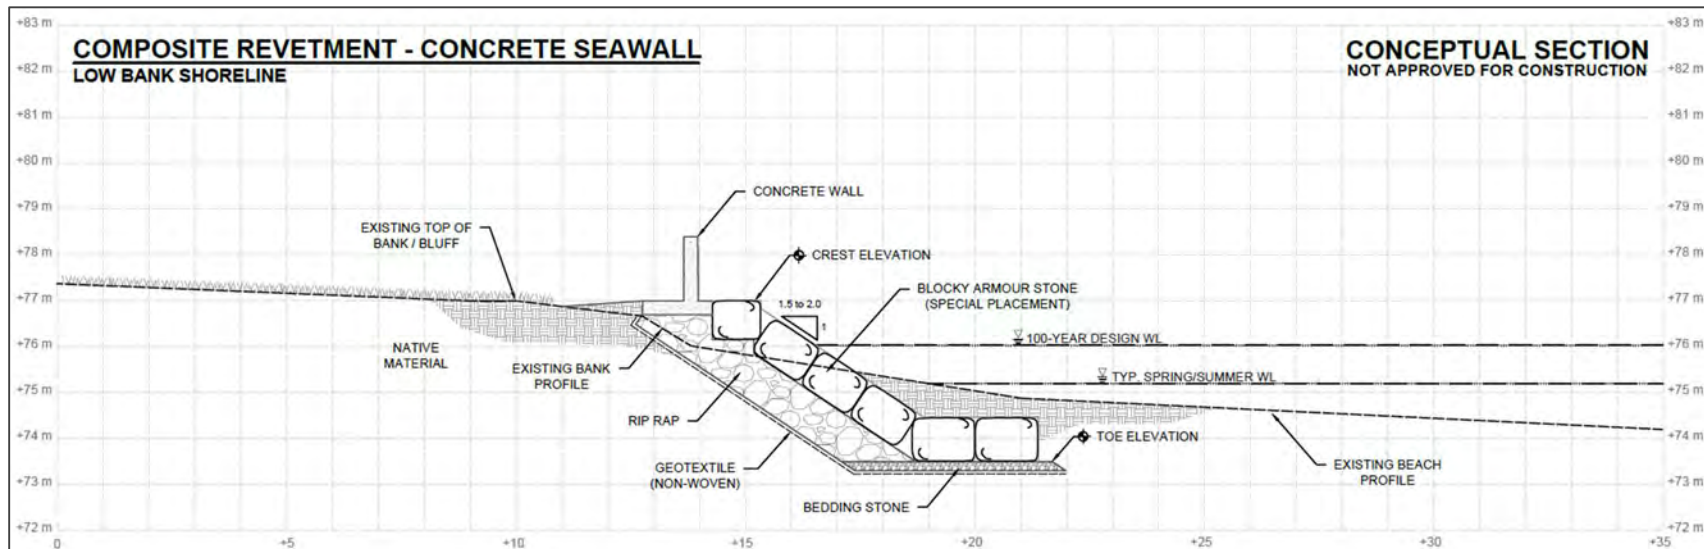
Typical composite revetment – concrete seawall concept for flood prone, low bank shoreline
